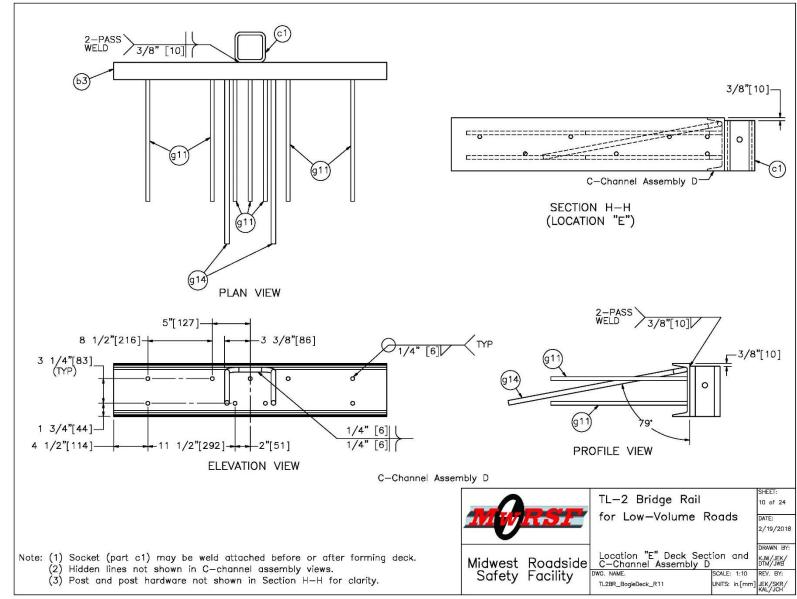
Bogie Testing Matrix and Setup, Location "E" Deck Section and C-Channel Assembly D
